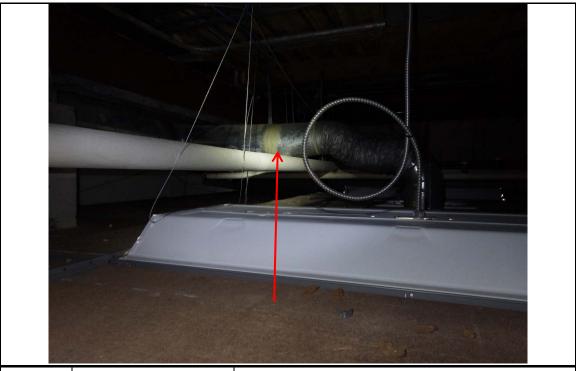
Date: Sept. 12, 2016Location: Storage Room B2
